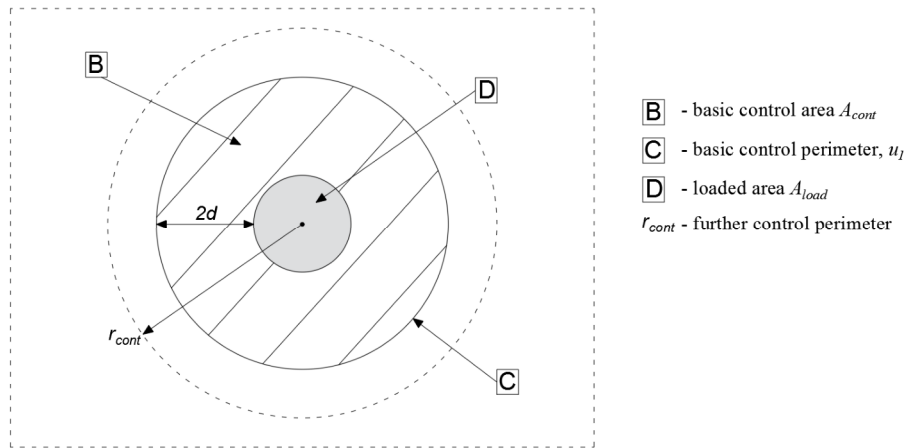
Plan view of calculation model adapted from ('SS-EN 1992-1-1', 2008).
